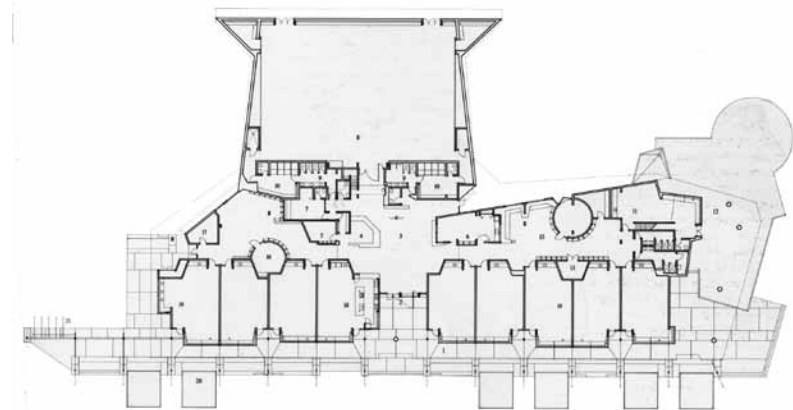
Plan of Seabird Island Community School illustrates the kitchen opening onto the atrium and community gardens; circular resource rooms and library open to the corridor; classrooms, collective porch and teachings gardens on the south; large gymnasium/community hall to the north.
